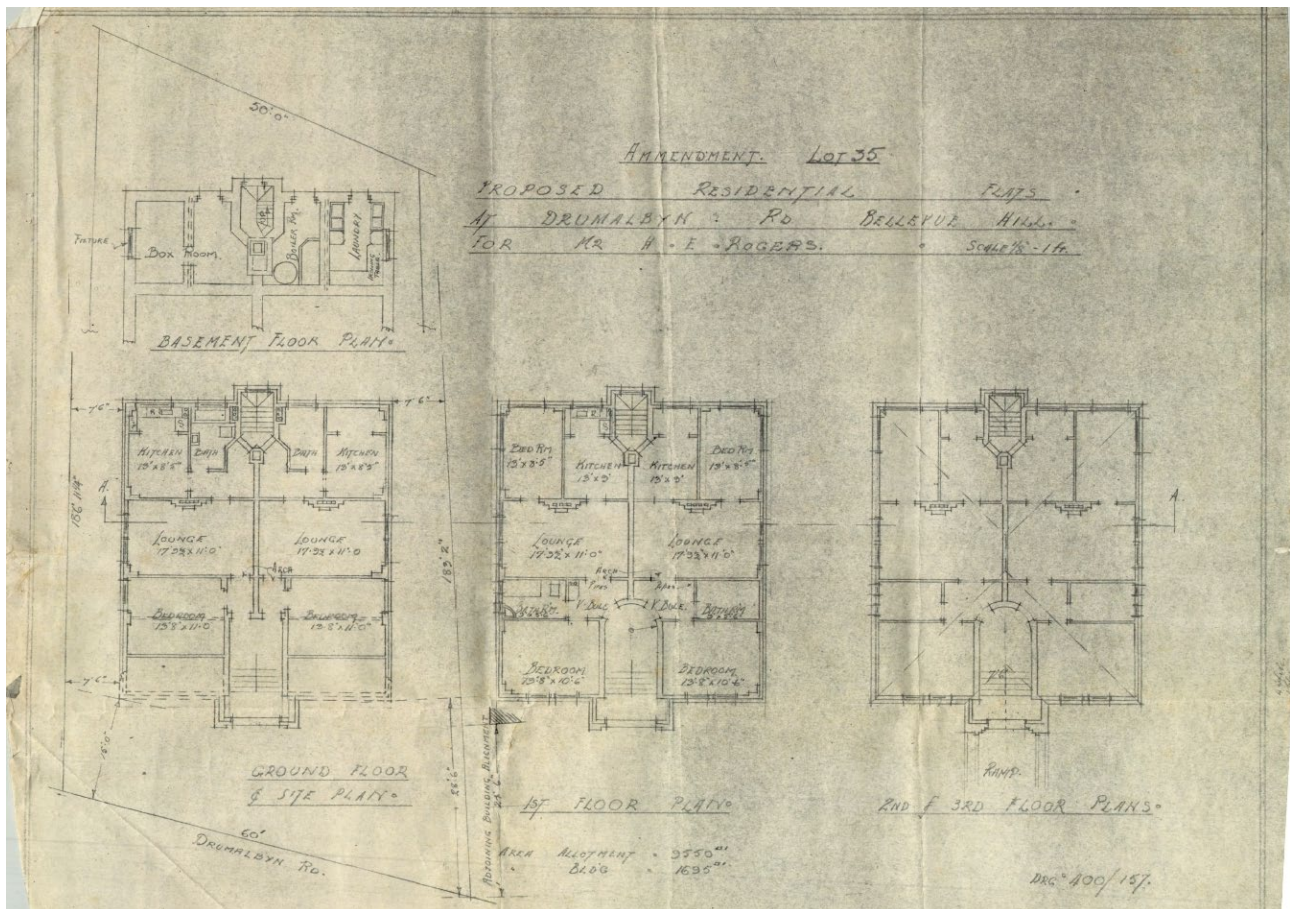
The final design for 80 Drumalbyn Road seems to have stayed largely true to these floorplans. If another architect was brought in, they made only minimal changes. These plans show the name of the developer – H. E. Rogers.
